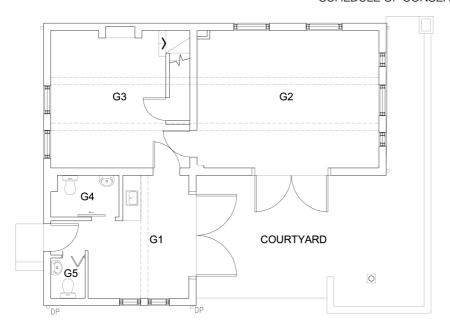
Coach House, ground floor plan, not to scale. Source: Tanner Architects 2010.
